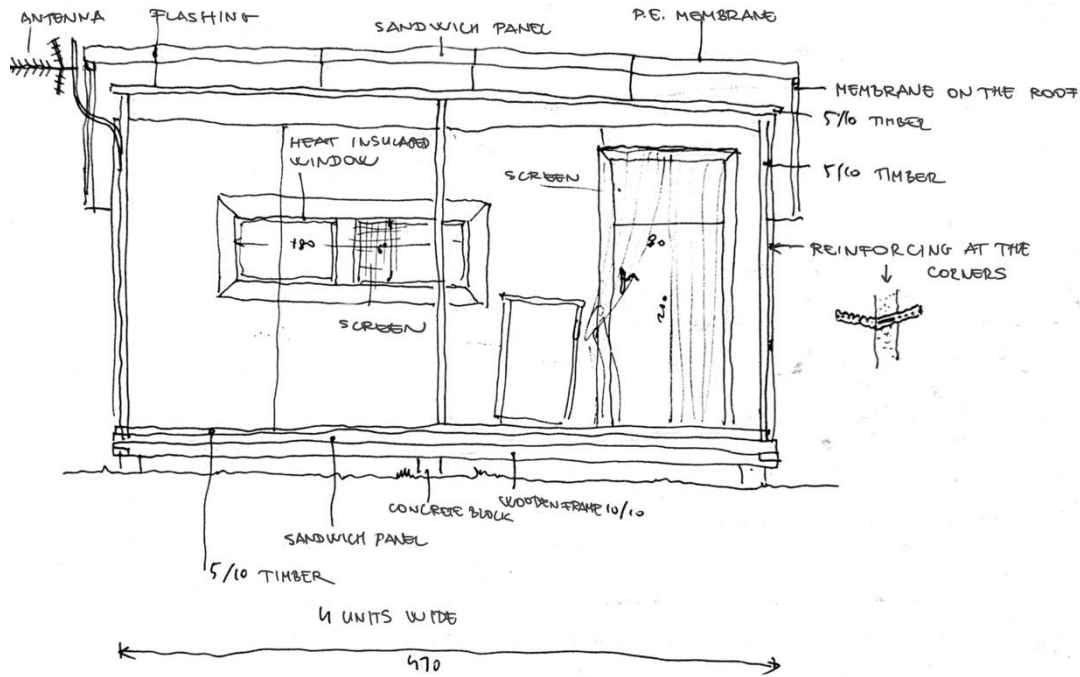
A house built from sandwich panels raised off the ground: author's own illustration
